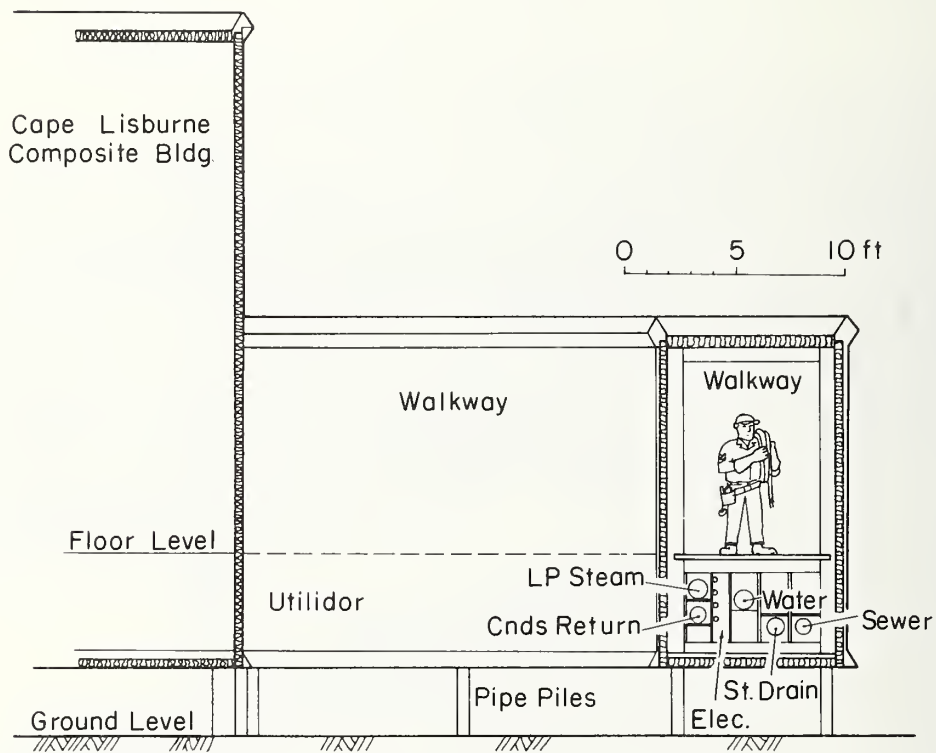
The elevated walkway-utlidor and the warm utility space below the first floor of the elevated composite building at Cape Lisburne, Alaska.
